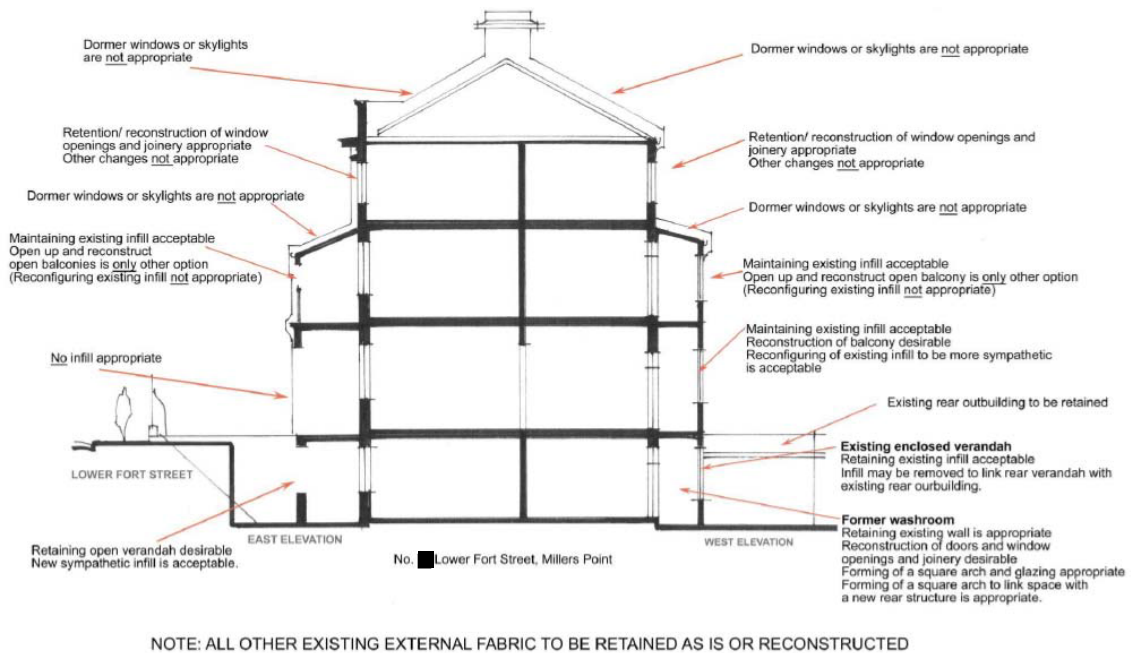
Section through [redacted] a building in Lower Fort Street showing possible changes to building exteriors (*Milton Terrace 1-19 Lower Fort Street, Millers Point Conservation Management Plan* (Volume 1), Clive Lucas, Stapleton and Partners Pty Ltd, 2014, prepared for NSW Land and Housing Corporation Department of Family and Community Services, p. ix (reproduced with permission).
